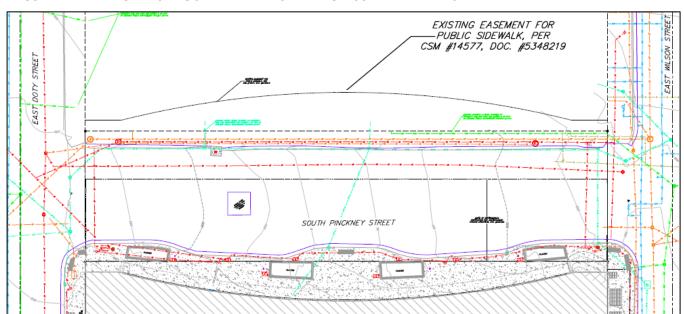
EXTENT OF EXISTING SIDEWALK – EXCERPT FROM SUBMITTED PLANS
